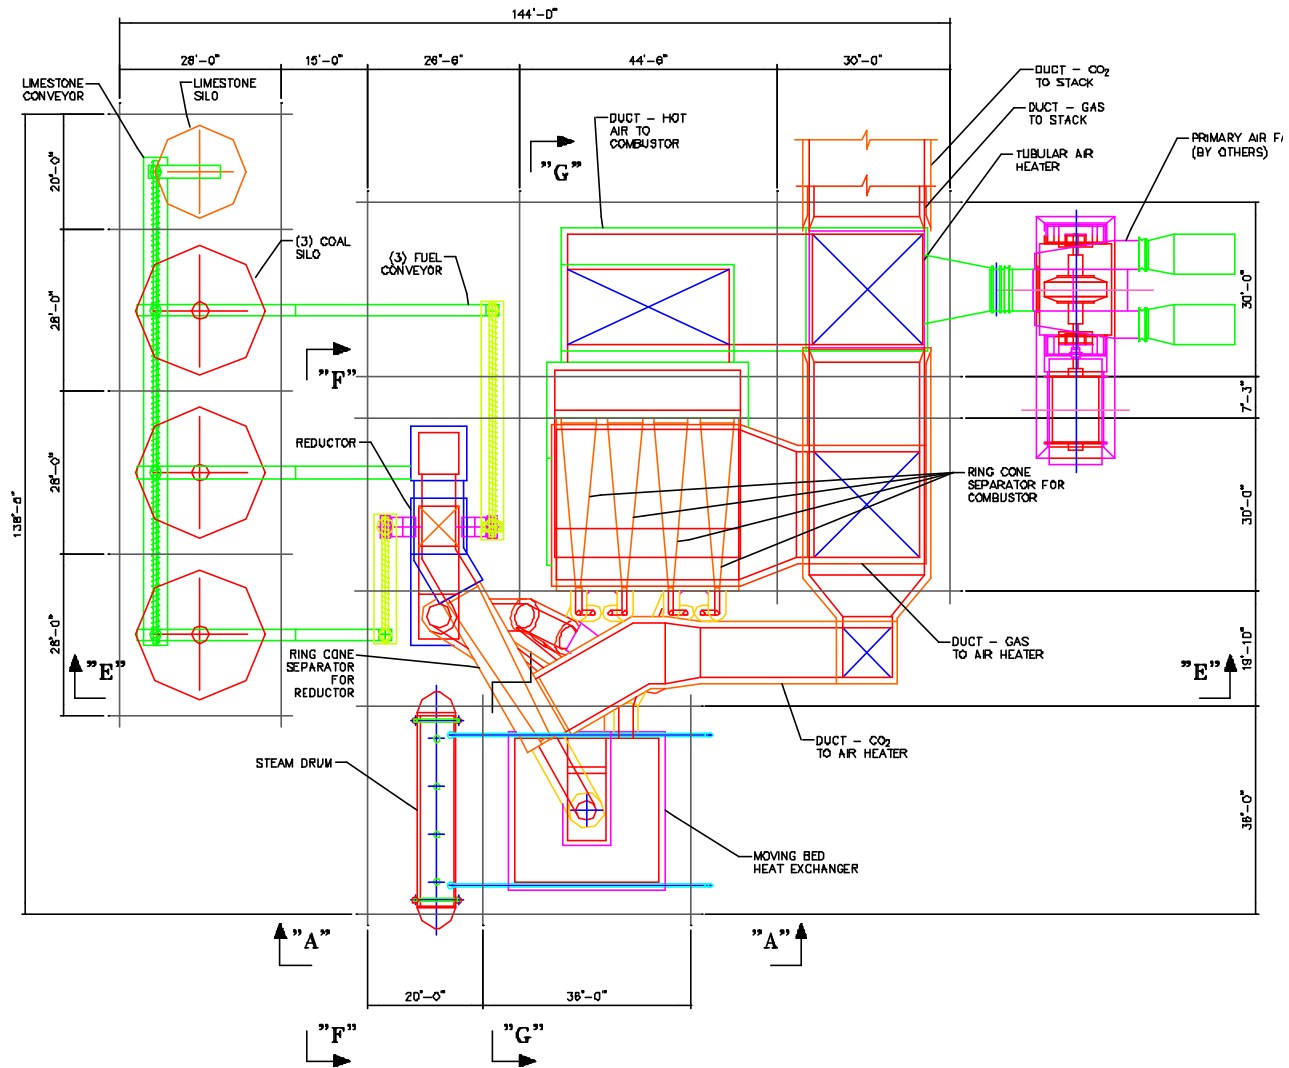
3: Case-7 Boiler Island General Arrangement Drawing – Plan View
